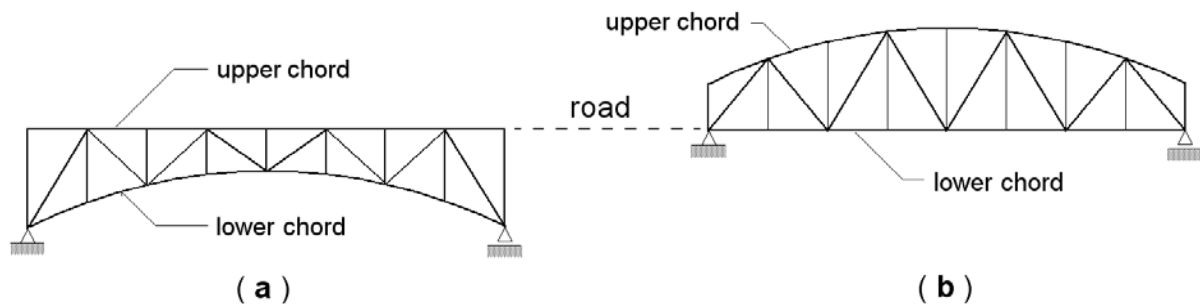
Examples of trusses for road bridges, a) below the deck and b) above the deck
